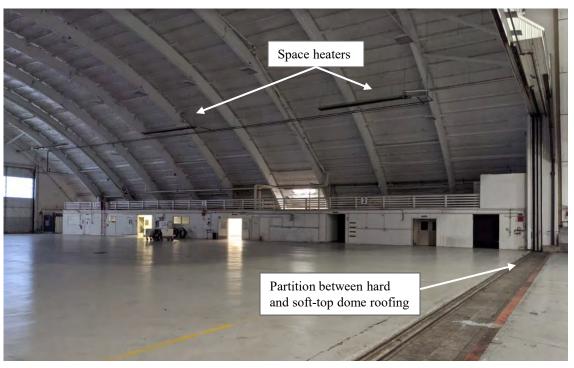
Main workshop area in C-1 Building with view of 2nd floor office space. Sample location for IA-12. Roll up garage doors lead to outdoor, gated parking lot.
